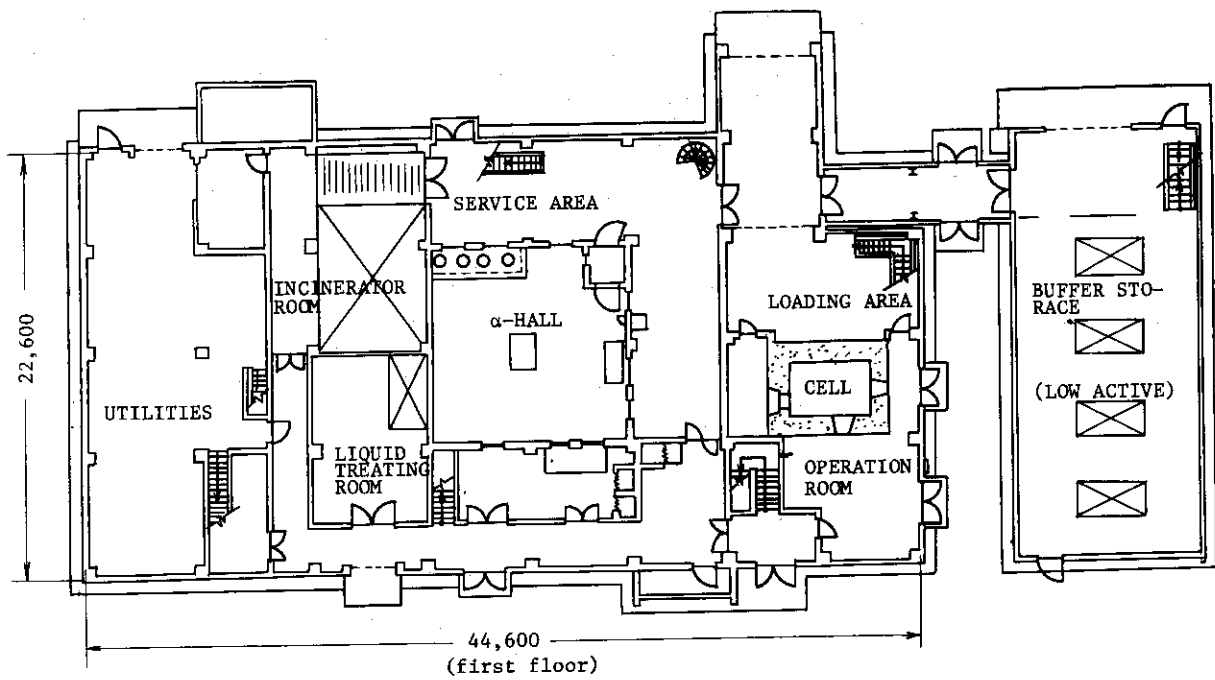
Plot plan of α -bearing solid wastes treatment building
